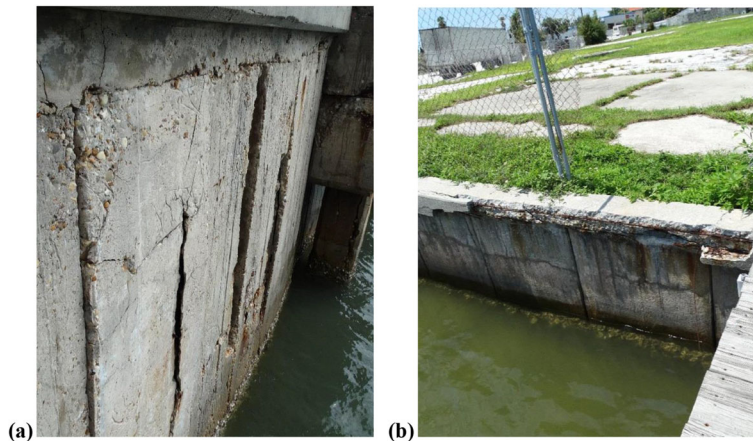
Typical examples of severe corrosion damage on concrete seawalls [95]
